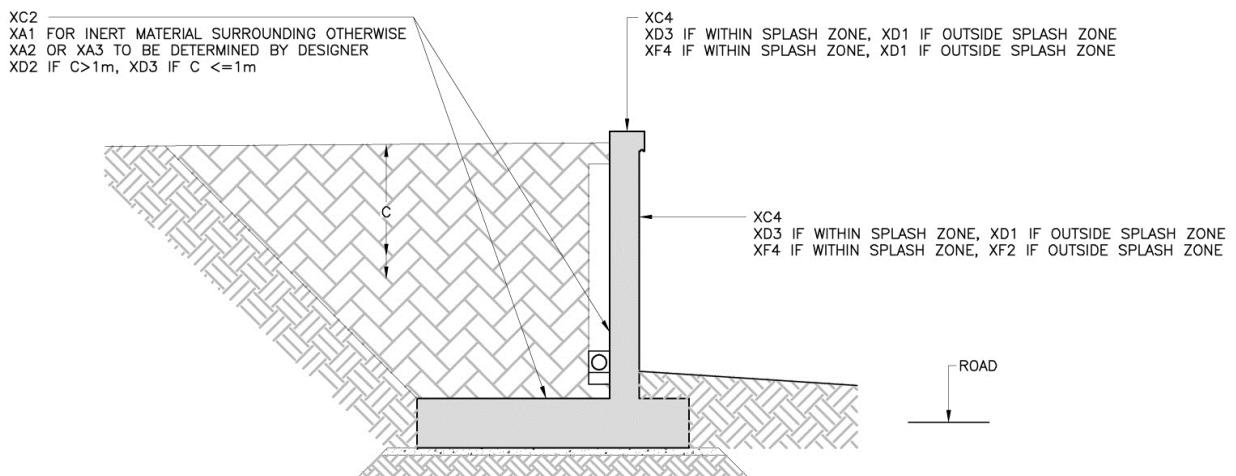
Wingwall / Retaining Wall (Road Adjacent only)
